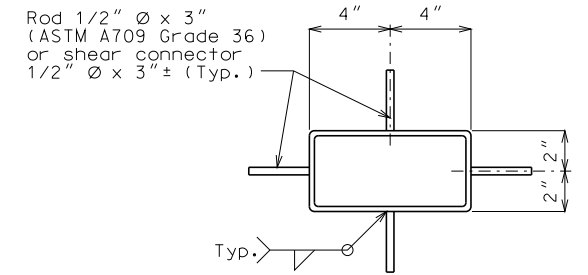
DETAILS OF DRAINS TRANSVERSE TO ROADWAY
